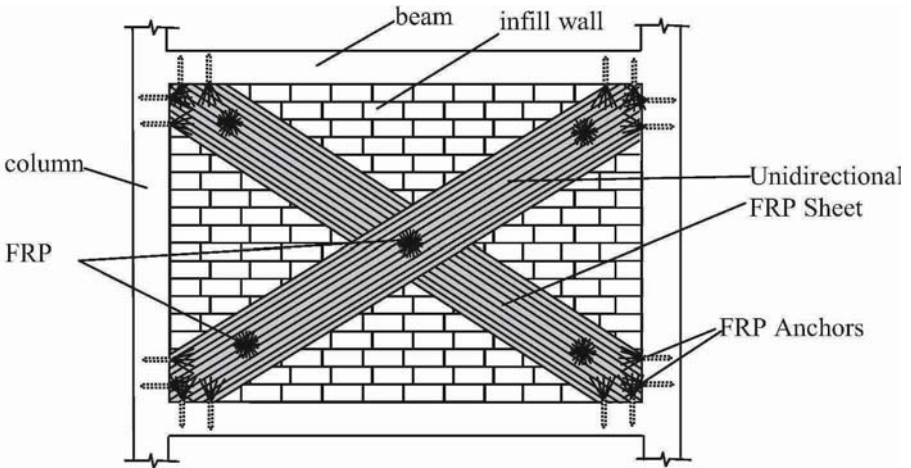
FRP strengthening method for reinforced concrete frames with infill walls
